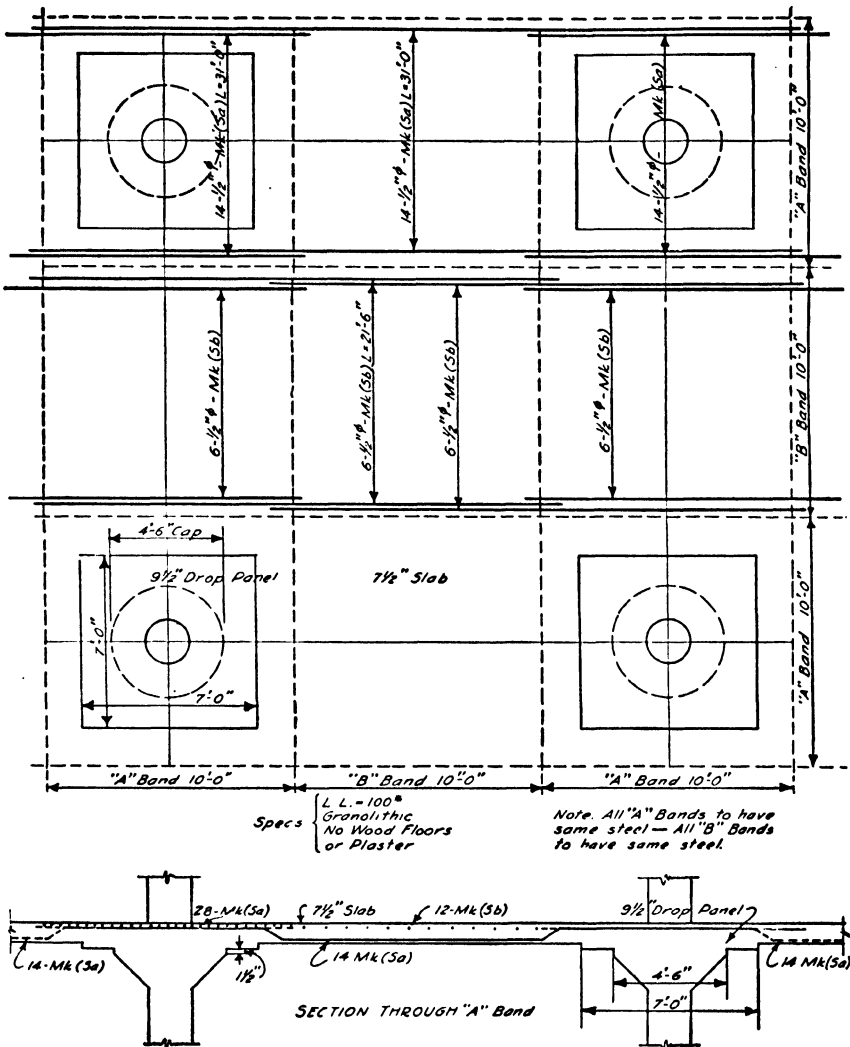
Framing for Flat Slab Concrete Panel.
